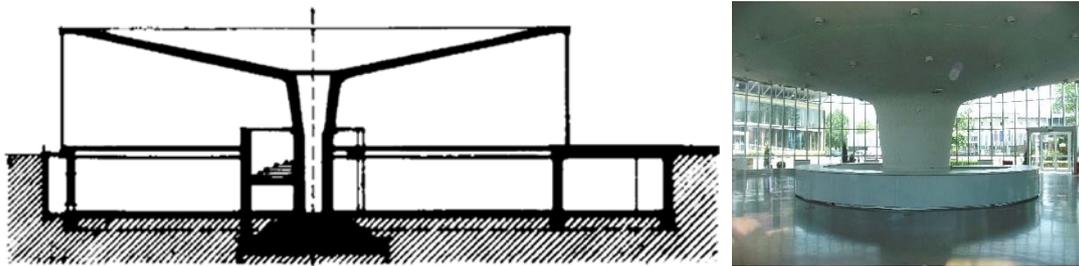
Cross-section [12] and photo [10] of the Jurček pavilion
